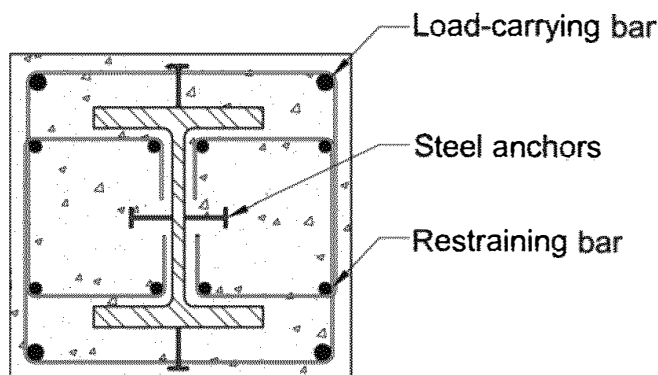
Example of a closed hoop detail for an encased composite column.
